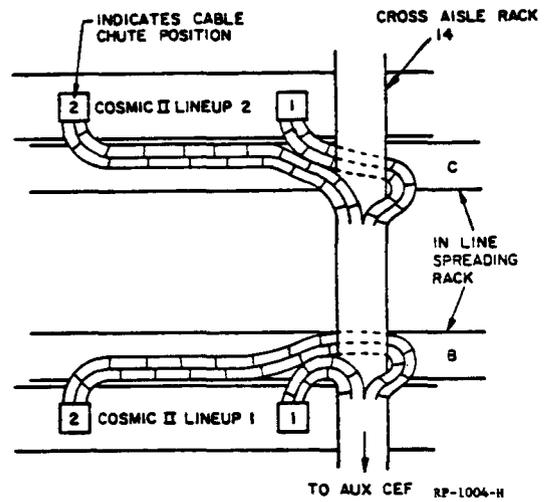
C "GULL WING" CABLE GROUP POSITION - TWO MODULES
